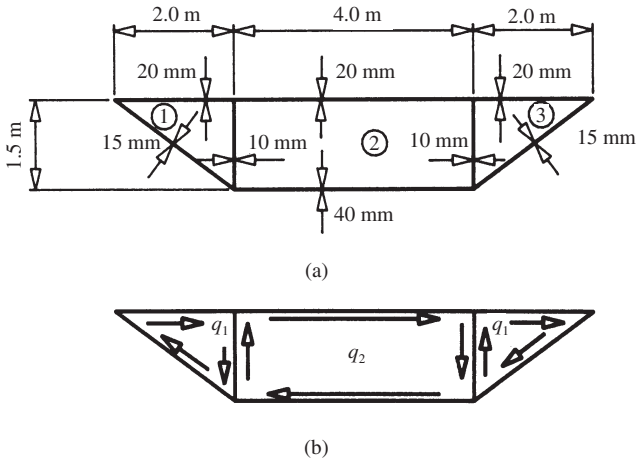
(a) Box girder example. (b) Shear flows (kN/m) in box girder
